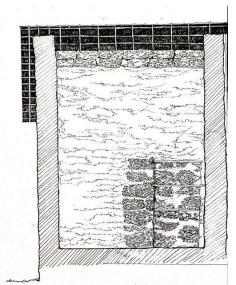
Provisions for niches and shelves in walls were made at the time of construction (Survey no. 15).
